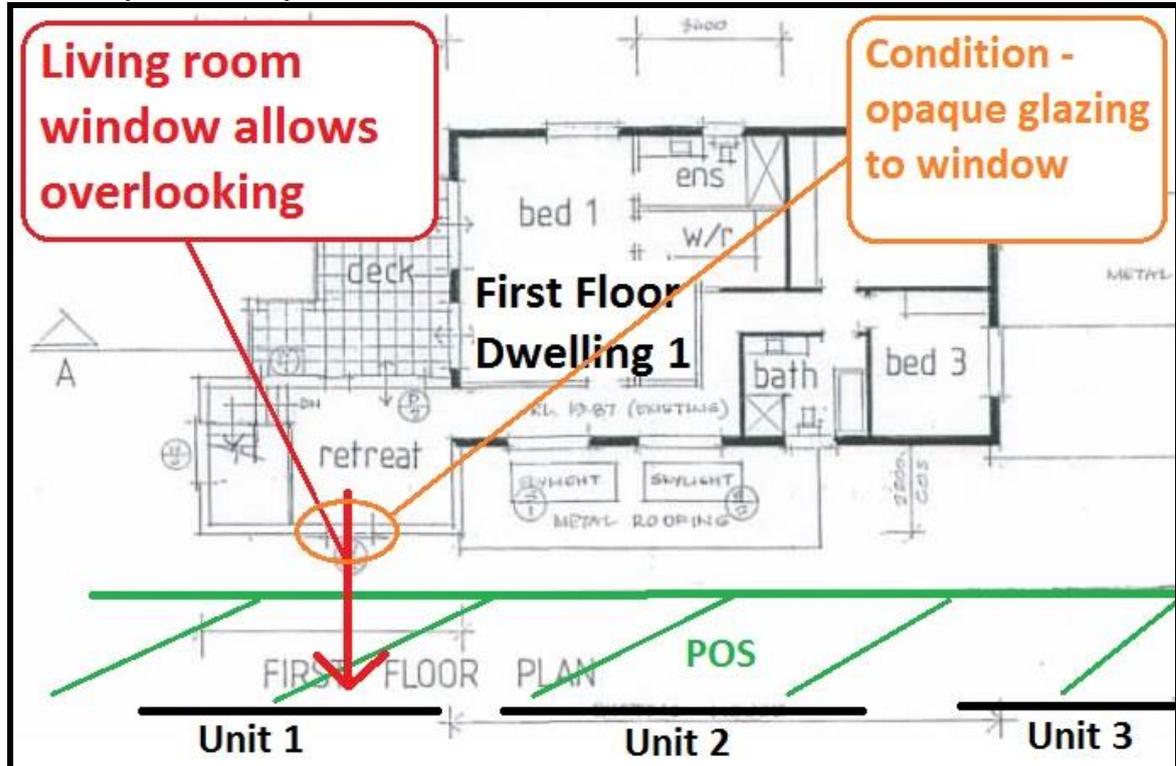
First floor plan diagram indicating that the south facing window of the retreat will allow overlooking into rear POS and rear living room windows of Unit 1 / 40-44 Frederick Street, to the south of the subject site. Recommended that a condition be imposed requiring opaque glazing or similar treatment on this window to prevent potential overlooking.
